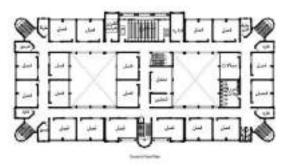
ENC3 Floor Plans (GAEB, 2021)
